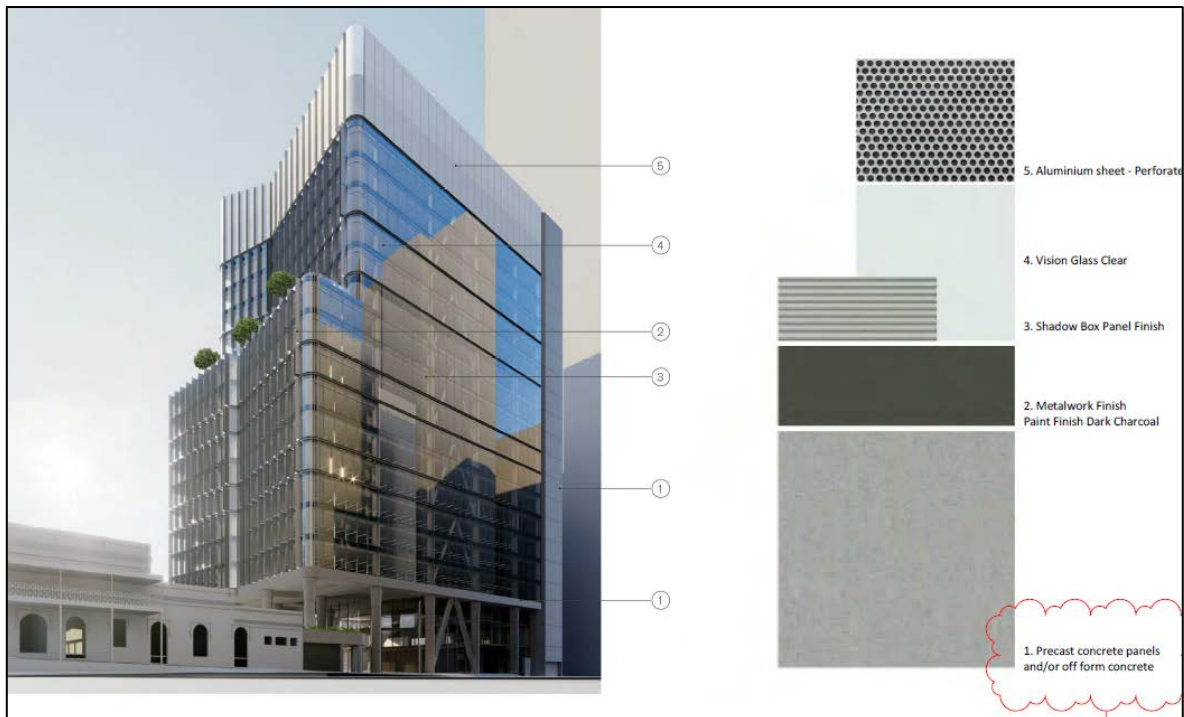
| External Building Materiality/Finishes (Source: EIS)
